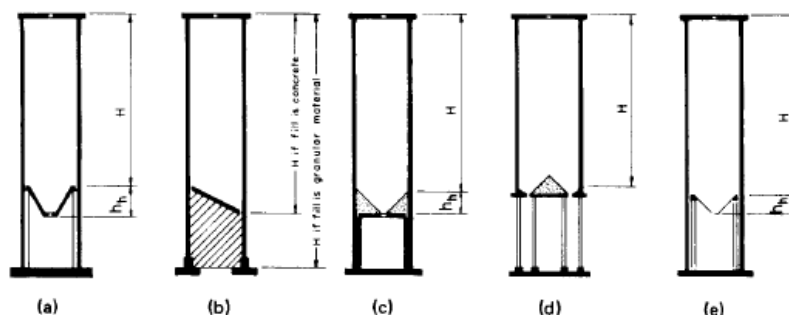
Typical vertical cross sections of silos. (a) Silo on raft foundation, independent hopper resting on plasters attached to wall; (b) silo with wall footings and independent bottom slab supported on fill; (c) silo with hopper-forming fill and bottom slab supported by thickened lower walls; (d) silo with multiple discharge openings and hopper-forming fill resting on bottom slab, all supported by columns—raft foundation has stiffening ribs on top surface; and (e) silo on raft foundation, with hopper independently supported by a ring beam and column system.
